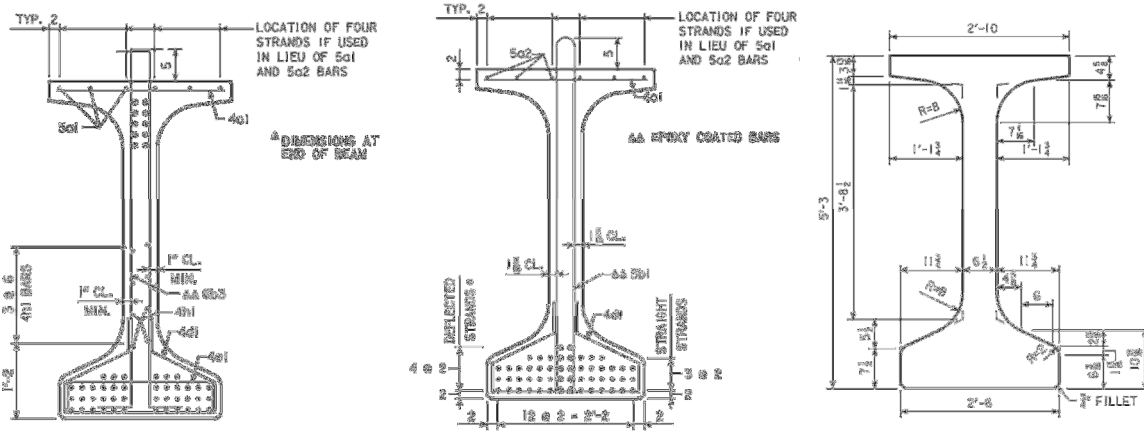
Cross section of the end span, the mid-span and the gross cross section of BTE 145 girder
